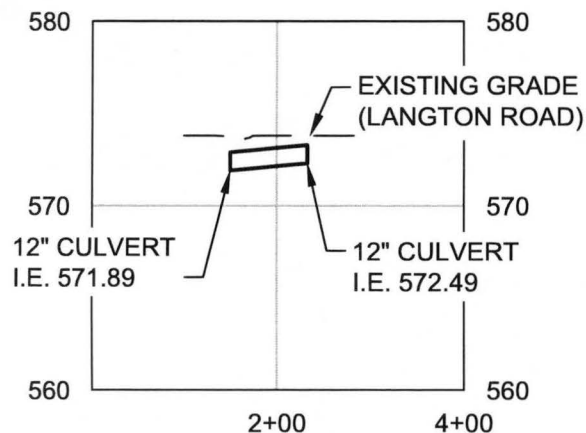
B NEW OPERATIONS ACCESS ROAD
